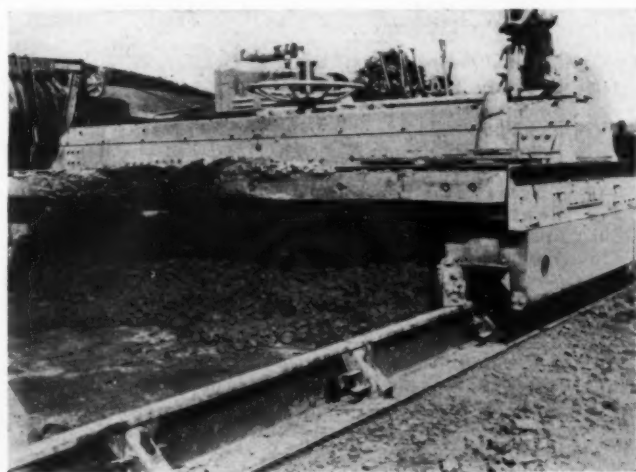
New Type Concrete Spreader in Which Rotating Paddles. Like the Rotor of a Domestic Tub Washing Machine, Spreads Concrete Just Dumped From the Mixer
